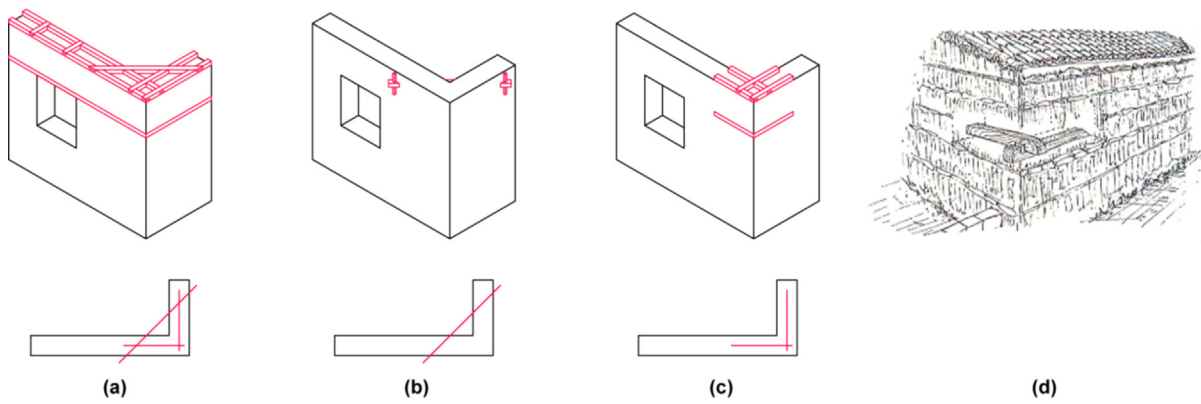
Different types of corner braces: (a) stiffening ring beams; (b) independent corner brace attached to the wall with wedges; (c) partial ring beam at the corner; and (d) timber corner brace in rammed earth building in Alentejo, Portugal [47].
